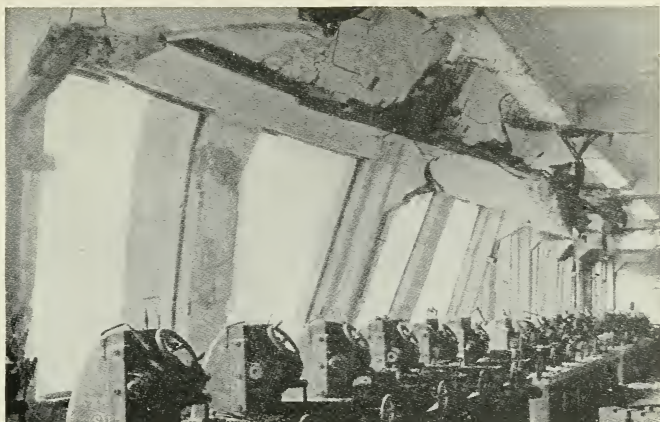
Second floor of reinforced-concrete framed building, 1,900 feet from ground zero, showing fractured third-floor beams, and failure of columns at windows.
